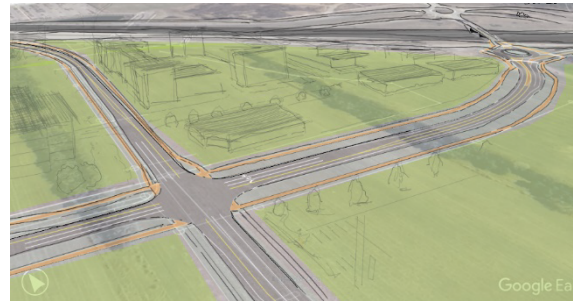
100th Street extension and connection to West Point Douglas Road and Highway 61
